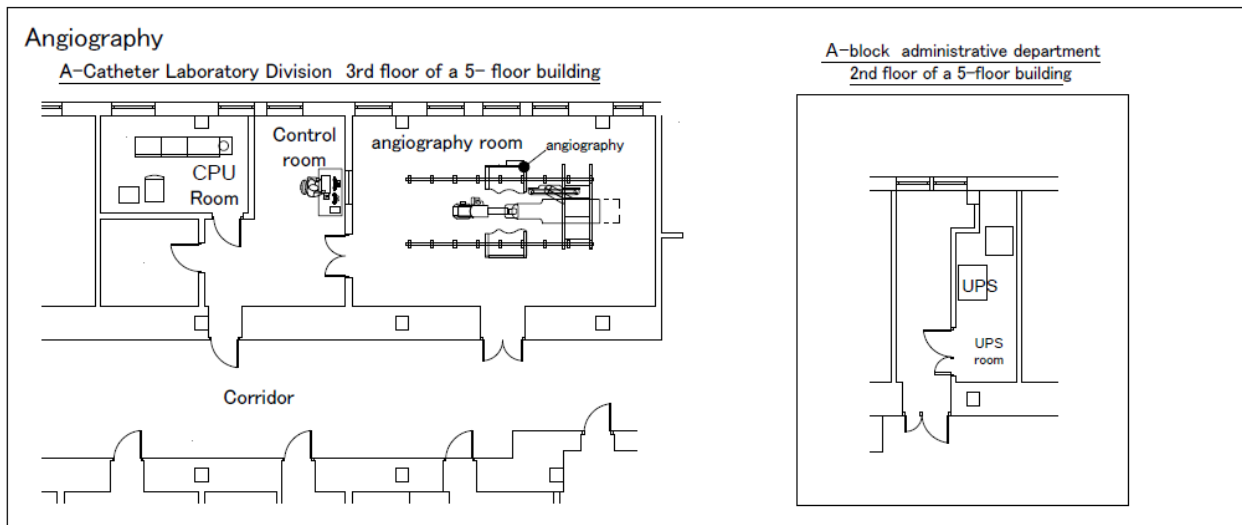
Floor Plan and Equipment Layout (NCCIM)
